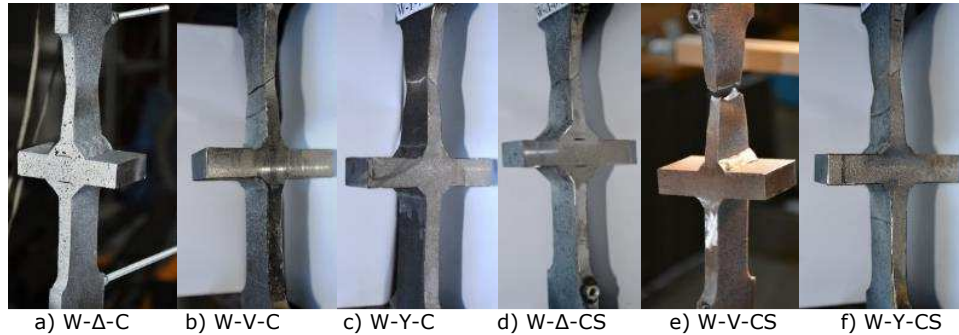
Reduced zone of welded T-stubs at failure
